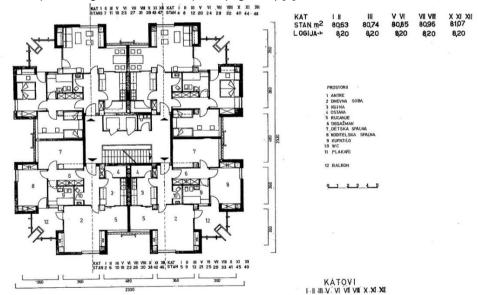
Typical floor plan of City Wall Tower (Source: Master plan for Skopje, 1965)
